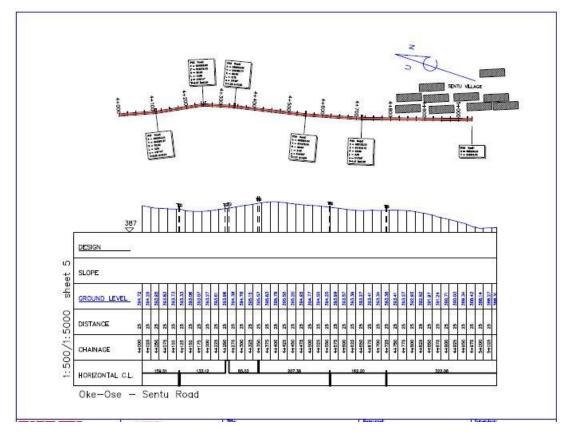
showing the Profile and Longitudinal Section from Chainage 4+000-5+025
